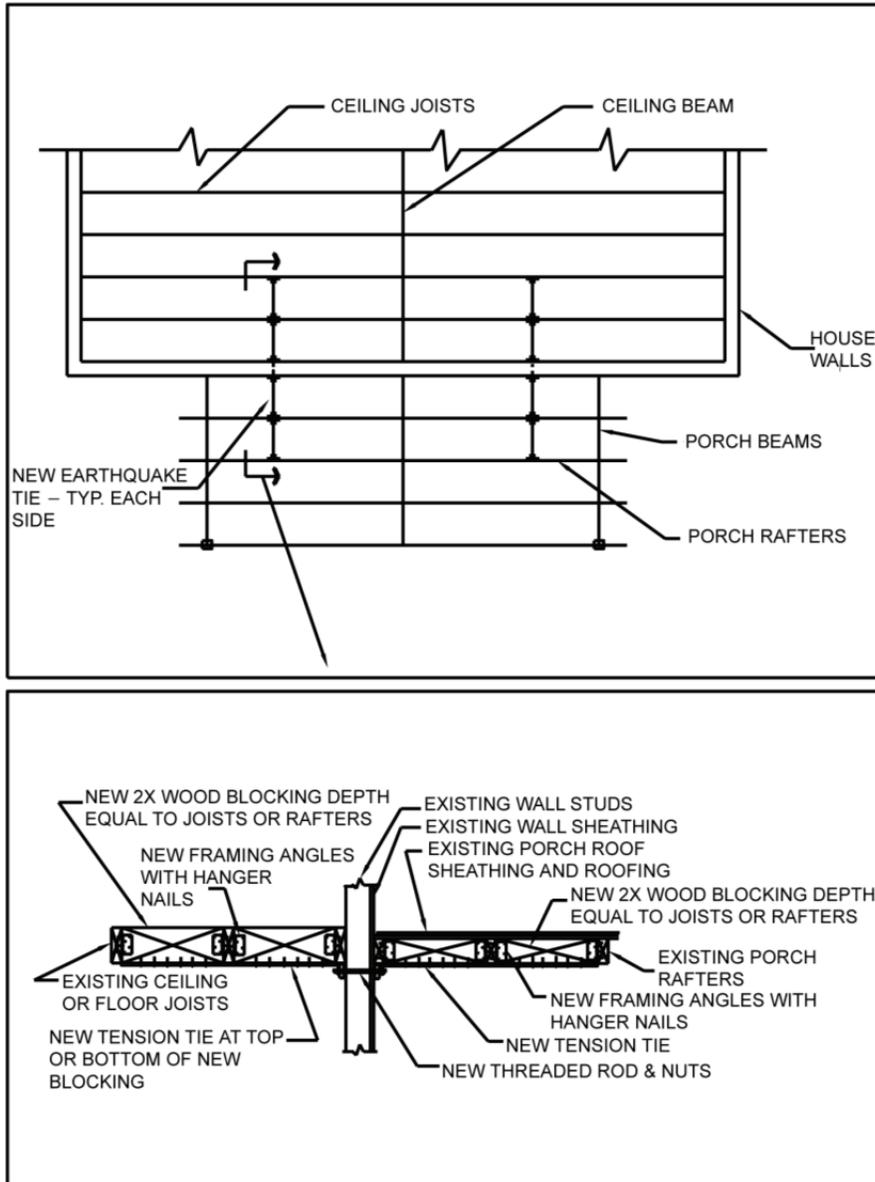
Retrofit connections of parallel porch roof framing to parallel joists in the house (from ATC, 2002).
